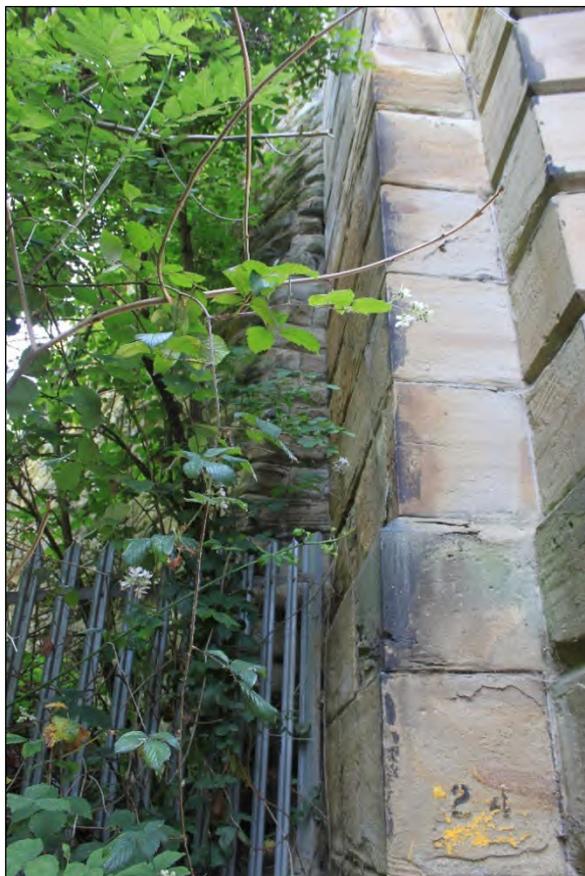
Eastern extent of northern wing wall east of bridge, facing north-west, 2m scale (IMG\_1243)
